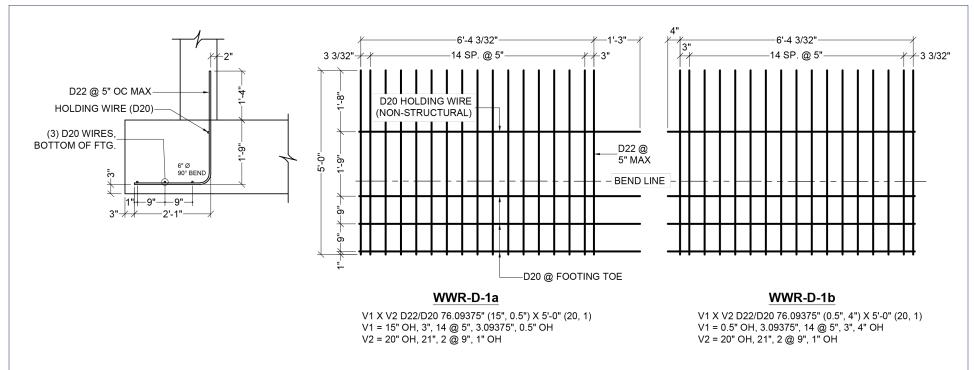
Wall Type 1–Wall Dowel Mat WWR-D-1(a) and WWR-D-1(b)
